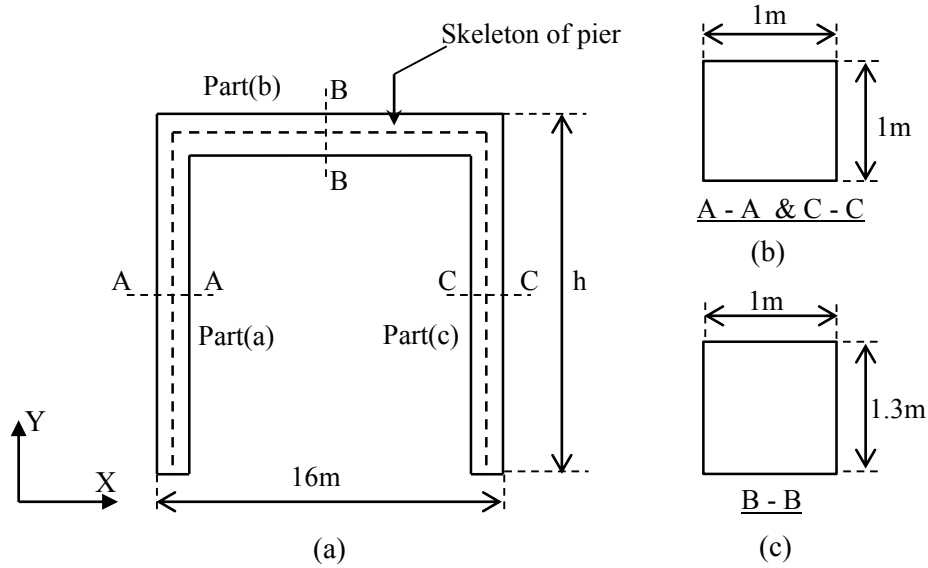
The geometry of simple bridge pier: (a) cross section of bridge pier; (b) cross section of A-A; and (c) cross section of B-B.
